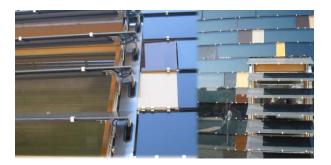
Acrylic Glass on windows and facades and Plexiglass Walls (Haghighi, 2010)
